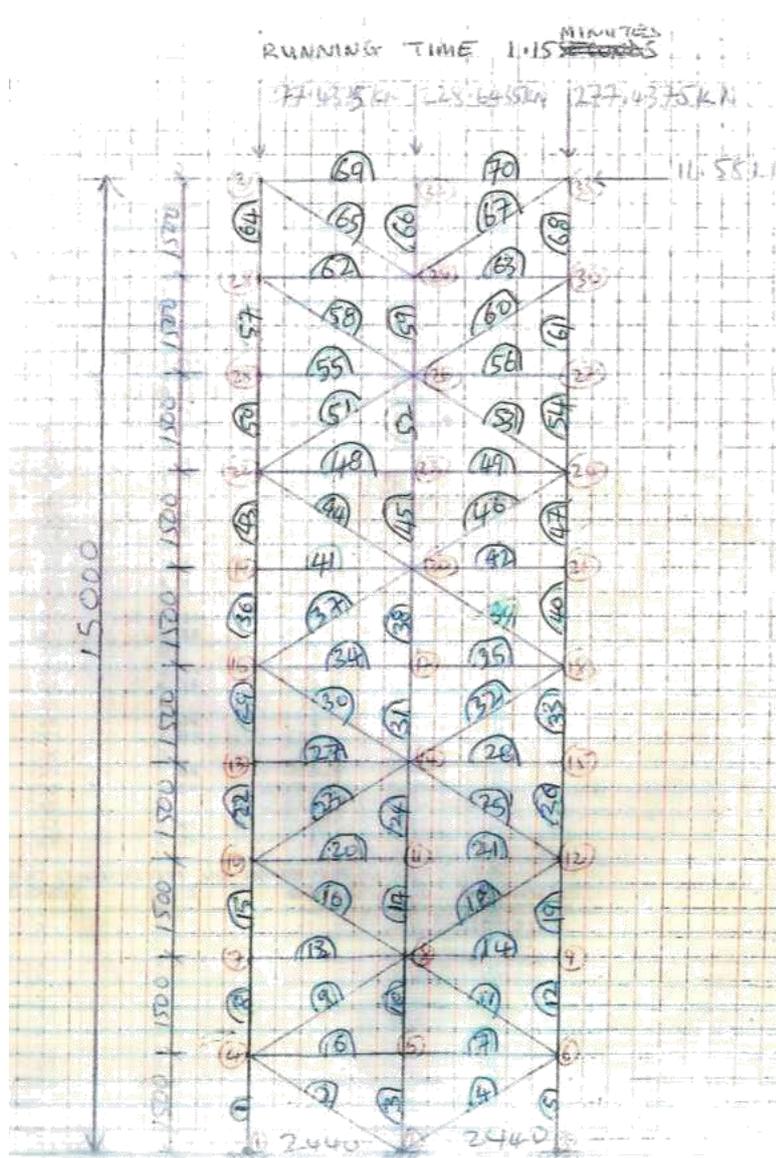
Discretization of 15m elevated tower with wind and dead loads
